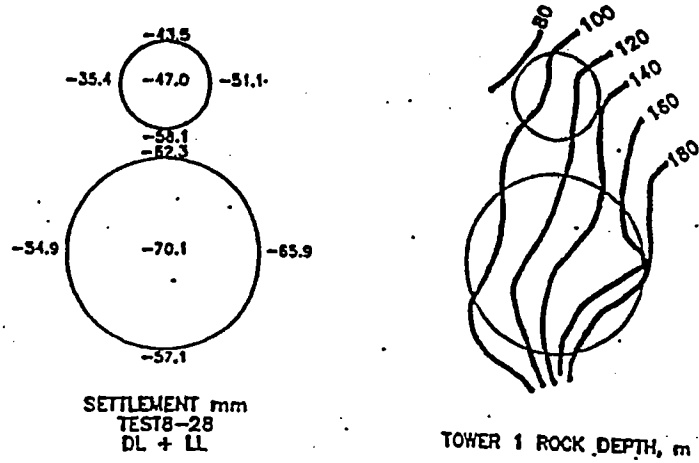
Tower 1 Settlement Map and Rock Contour Plan
